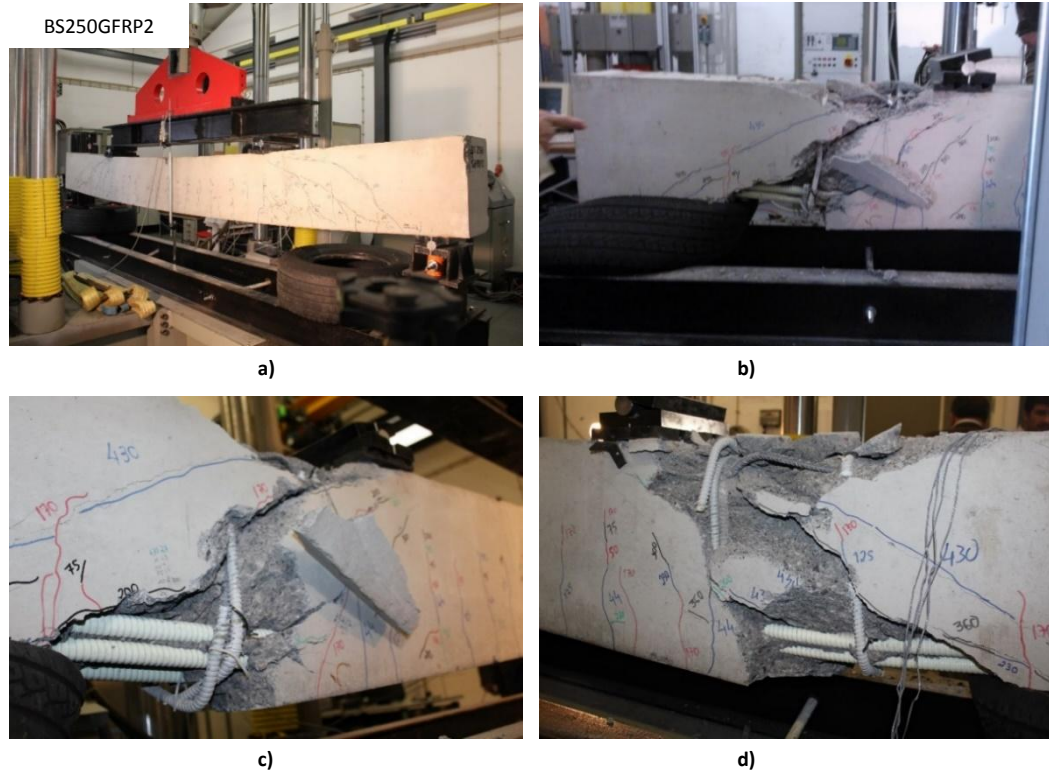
BS250GFRP2 failure: a) overall view before the testing; b) shear-span after failure; c) stirrup disintegration; d) concrete crushing under the loading point
